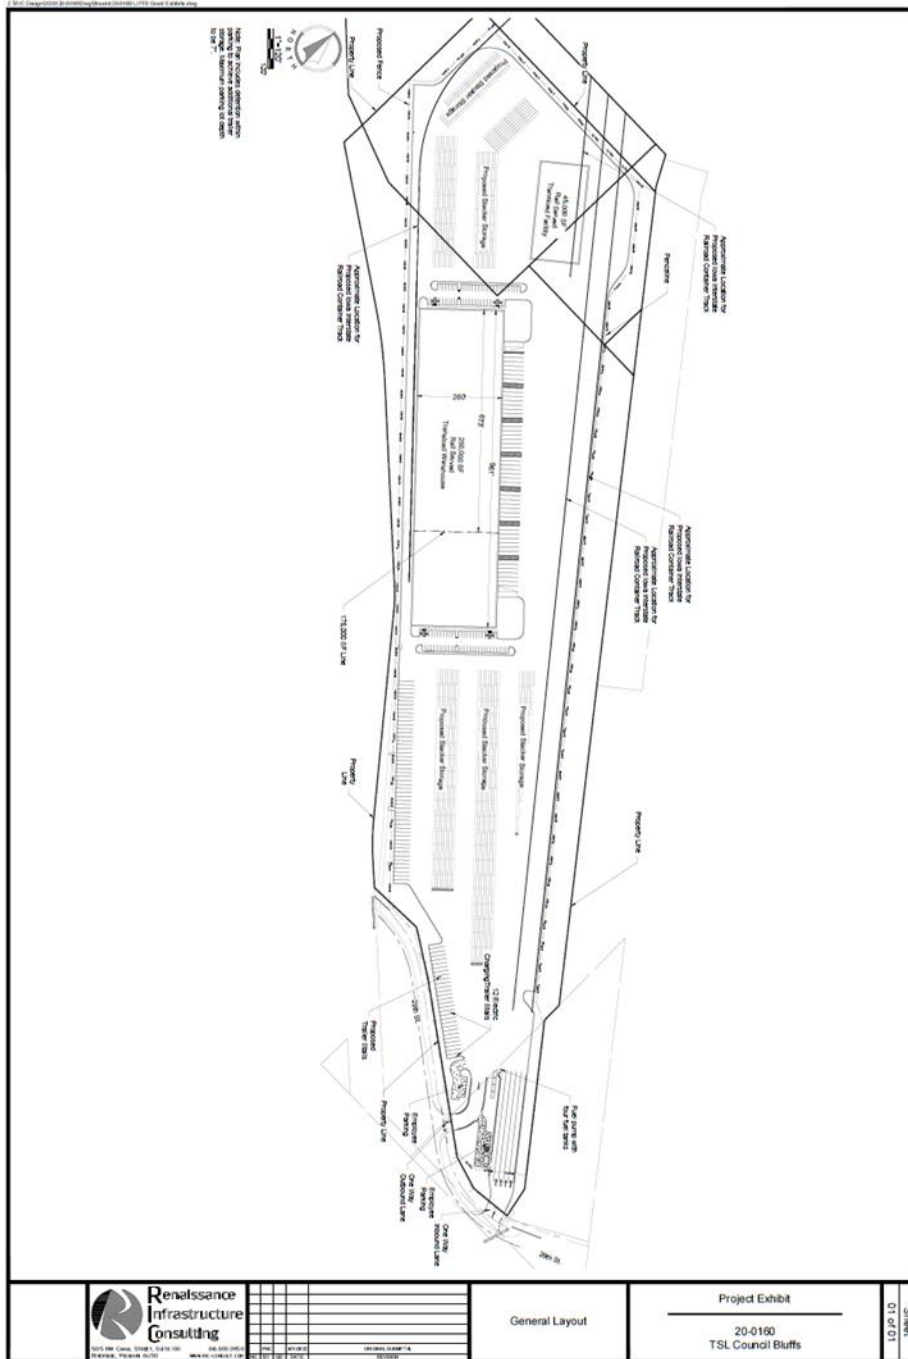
SITE PLAN FOR QUALIFYING IMPROVEMENTS
